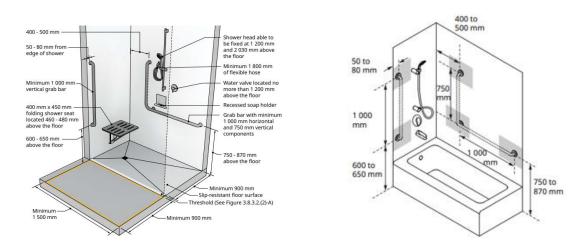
Accessible shower and acceptable grab bar layout of an adaptable dwelling unit bathtub
